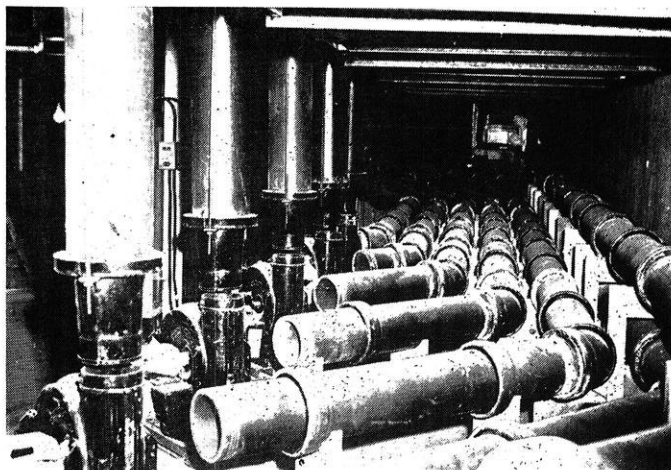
Over 2200 feet of 8 to 12 inch vitrified clay pipe is used in this installation to draw acid fumes from laboratories. The clay pipe ducts are led to the roof via the inside walls of the laboratories.
